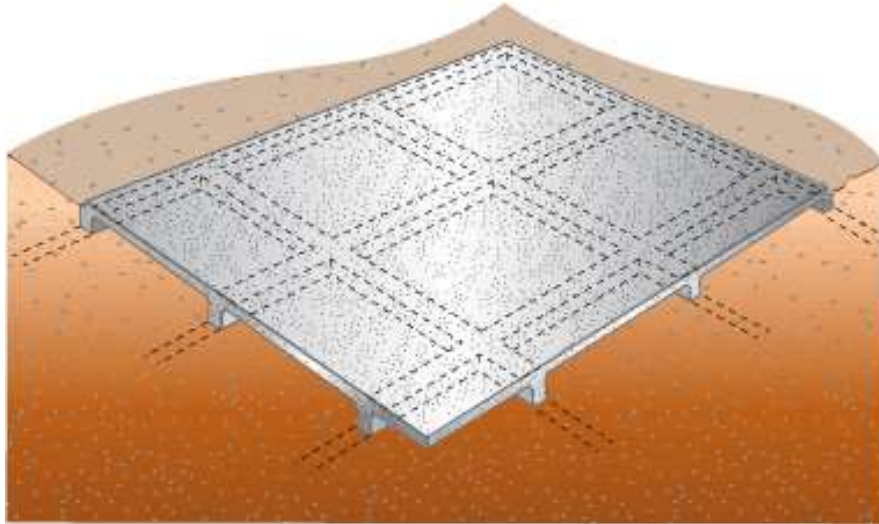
Raft slab with downstanding beams (Image credit: Build Right)
